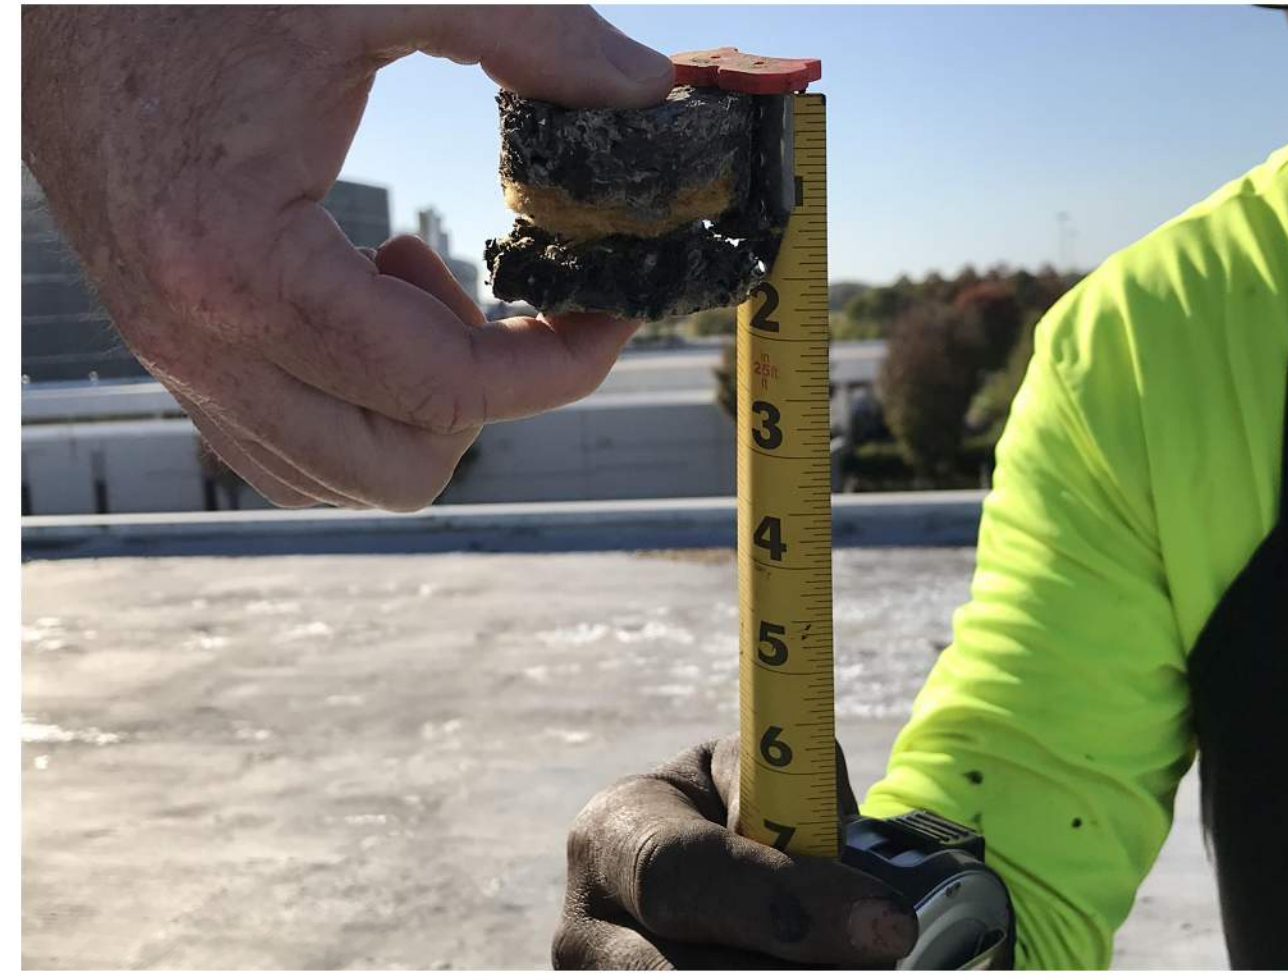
THE SECOND ROOF IS ABOUT 2'-3" THICK ON TOP OF 6" OF EXISTING LIGHT WEIGHT INSULATED CONCRETE OVER METAL DECKING. THE RECENT SECOND ROOF CONSISTS OF THE BUILD UP OF LAYERS OF CAPS SHEETS AND BASE SHEETS HOT MOPPED OVER FIBERBOARD THAT WAS MOPPED ONTO THE ORIGINAL PEA GRAVEL ROOF OVER LIGHT WEIGHT CONCRETE
